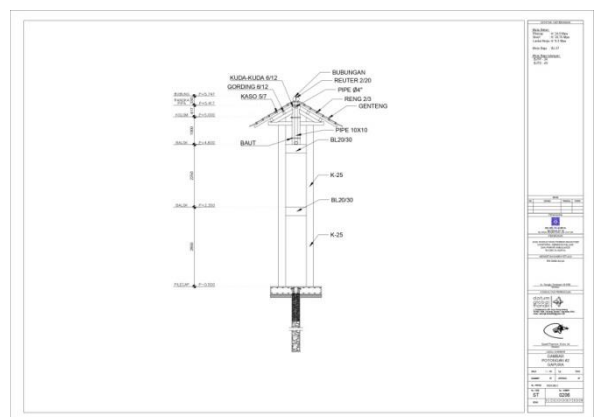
Exit Gate Roof Truss Pipe Plan Drawing
